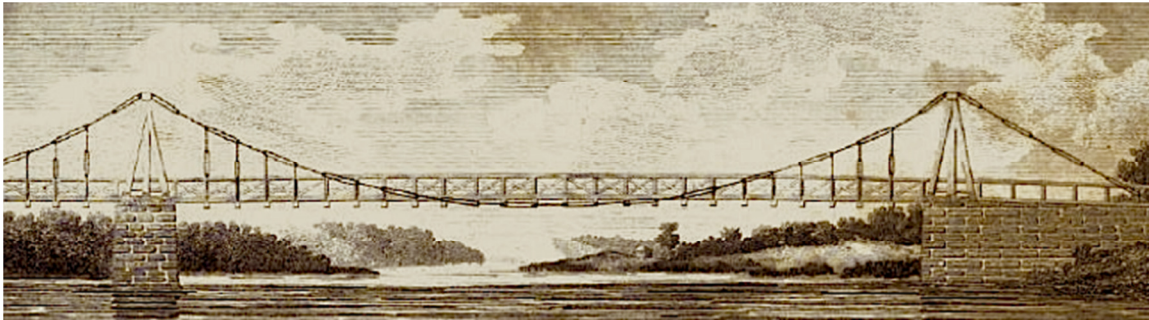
Chain Bridge at Falls of Schuylkill, Philadelphia, Pennsylvania [1.2]
